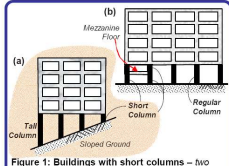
Buildings with short columns – two explicit examples of common occurrences.
